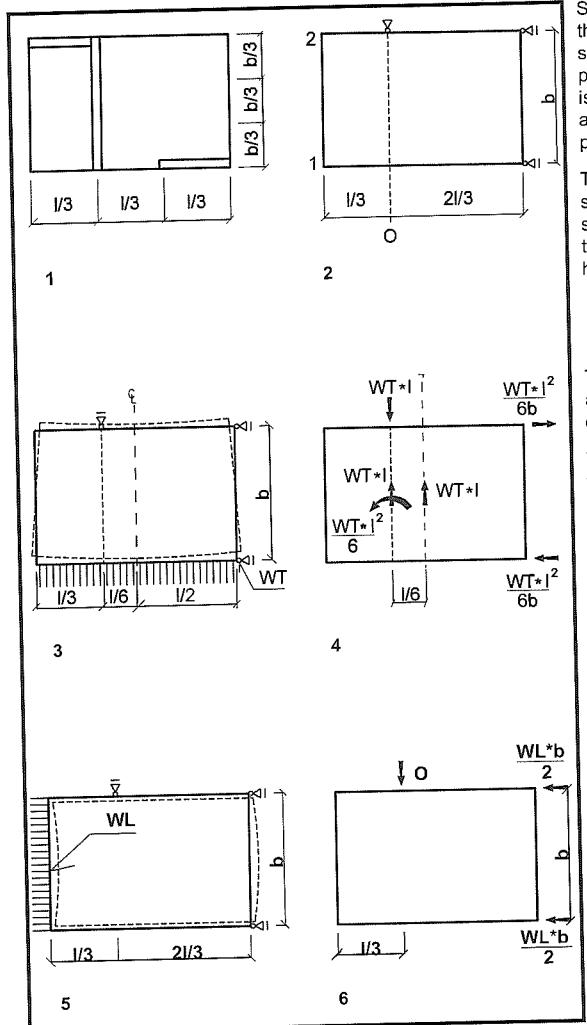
Statical Model Of Wall System For The Transfer Of Wind Load
